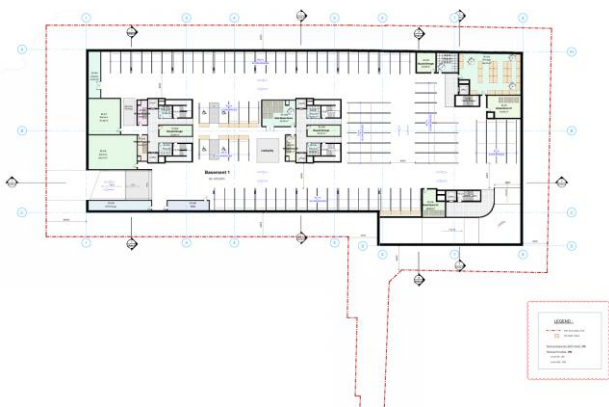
Previously proposed Basement 1 (Source: PMDL Architects)
